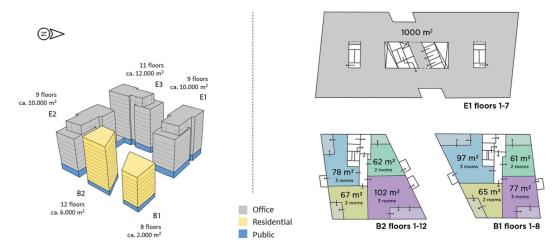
Overview of The Warehouses' office units (on the left) and residential units (on the right) [Figures made by Eszter Sántha, based on Google Maps 3D model (on the left) and floorplans of the Warehouses designed by AART architects (on the right)]
